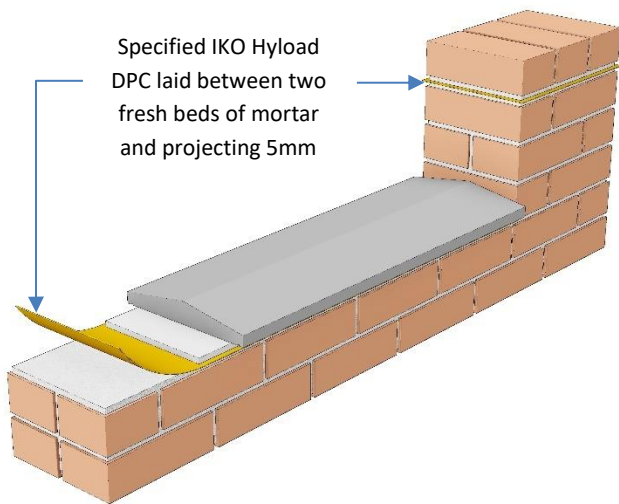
Coping Stones and Brick-on-Edge Detailing
